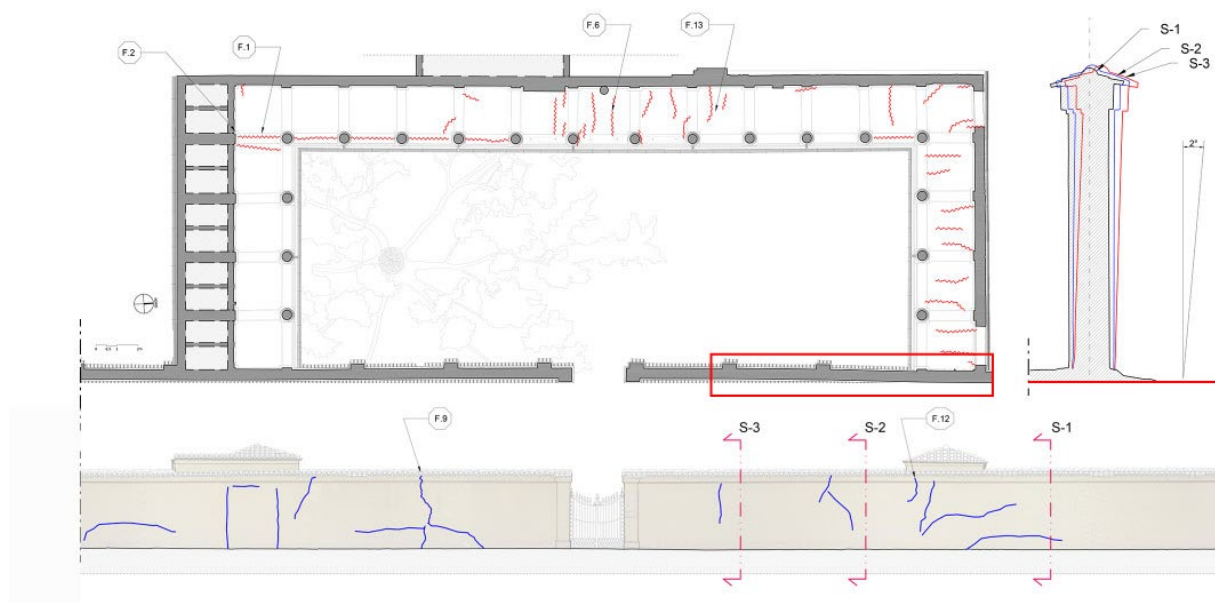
Hypography of the floor plan and foreign elevation with mapped lesions. In detail, masonry torsion with out-of-plumb calculations.
